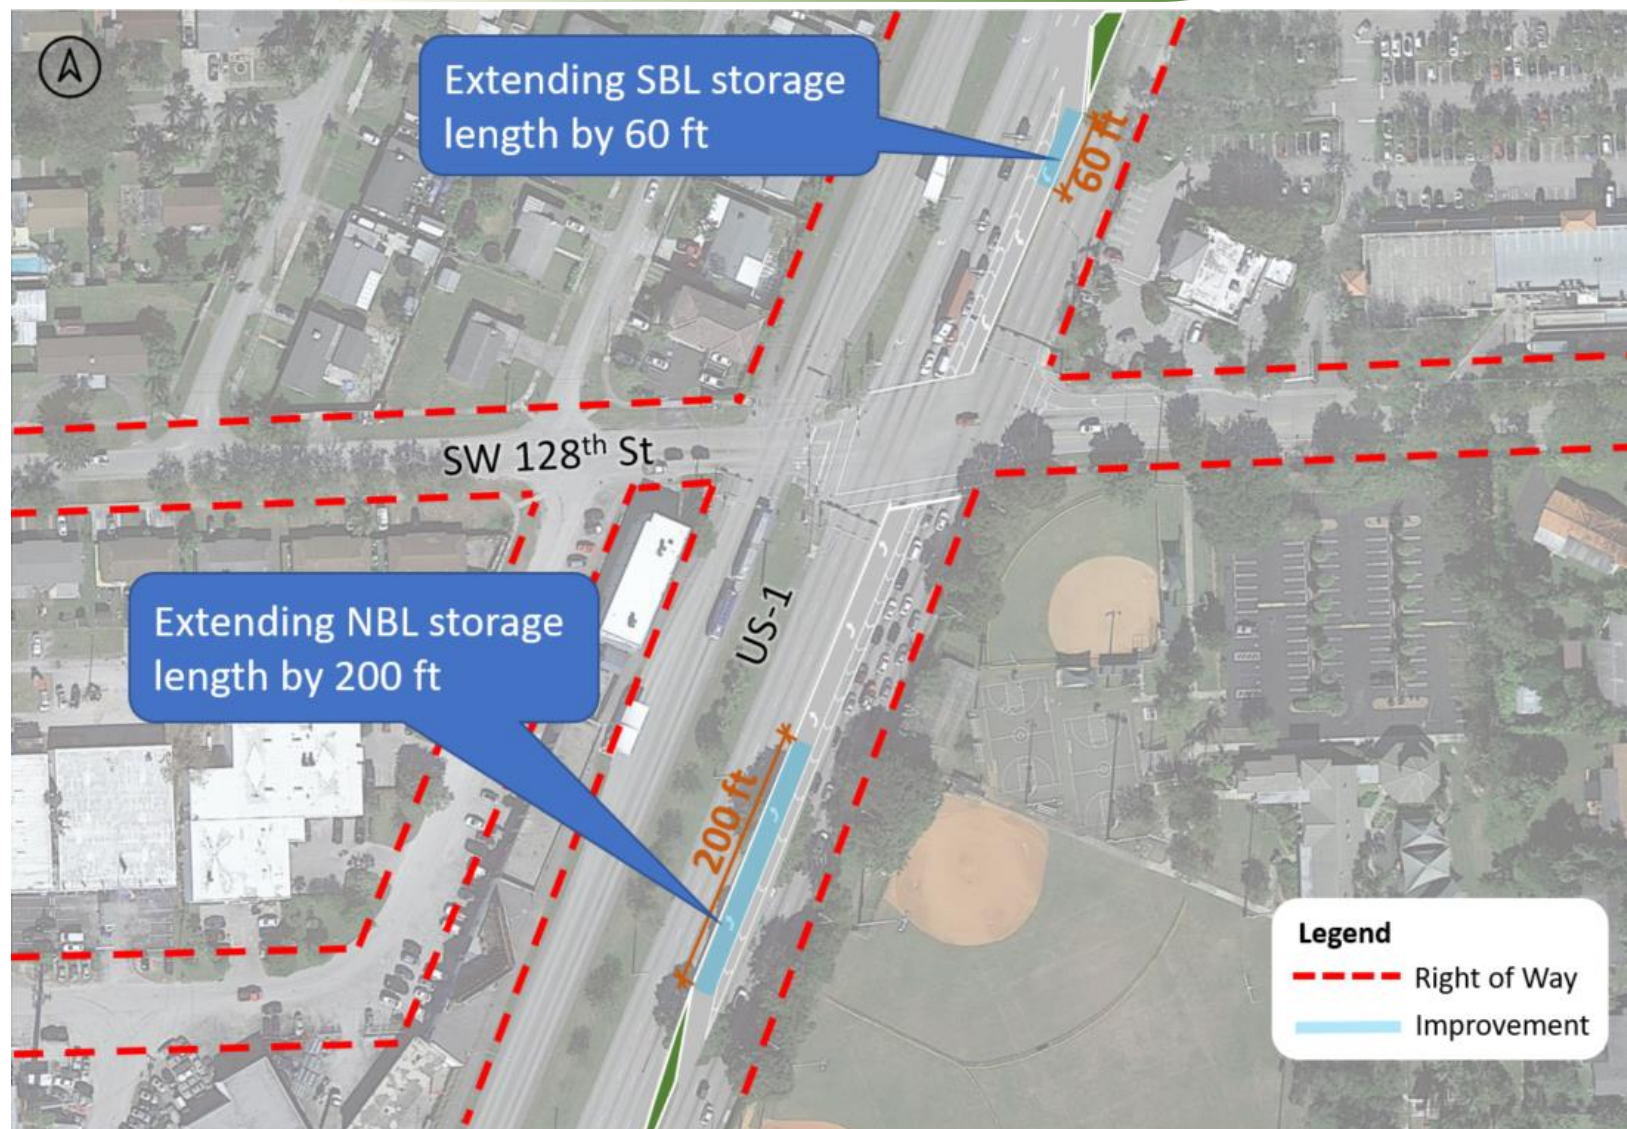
Conceptual Design Plan – US-1 and SW 128th Street
